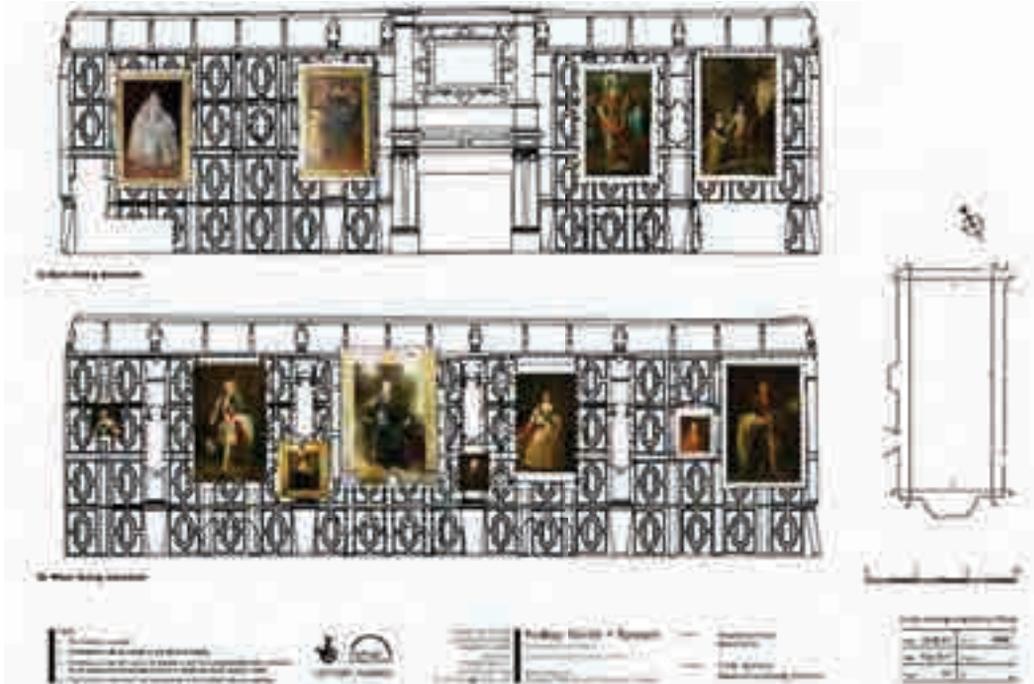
National Trust curators use of elevation drawings for designing new picture hang in the Ballroom (National Trust)
